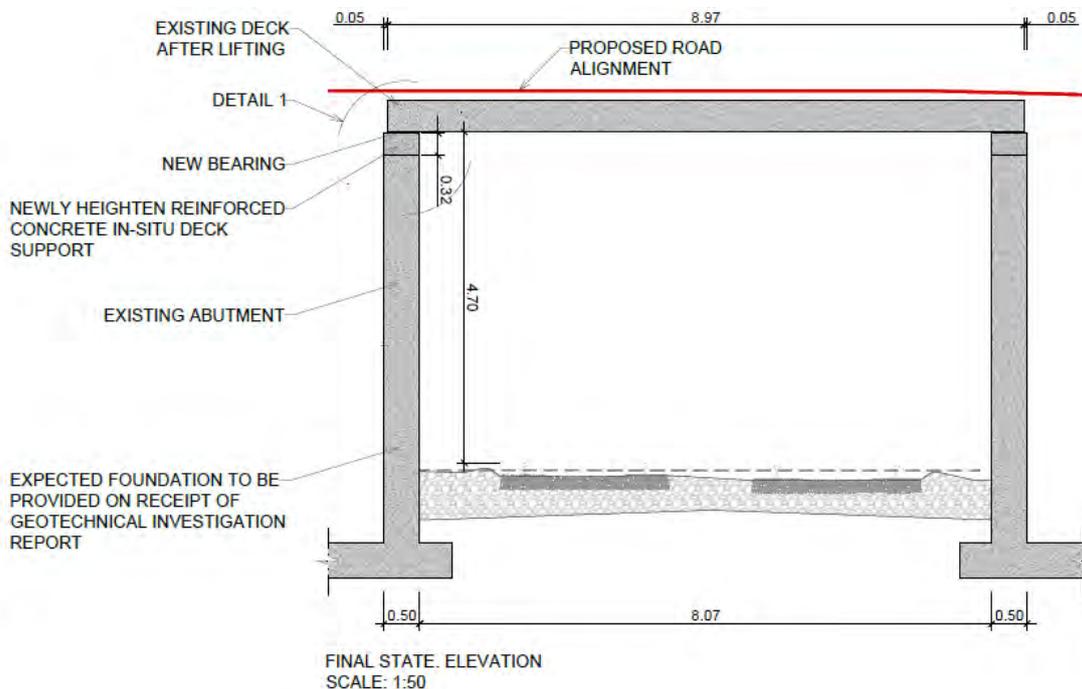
Elevation of OBG9 following deck lifting intervention
